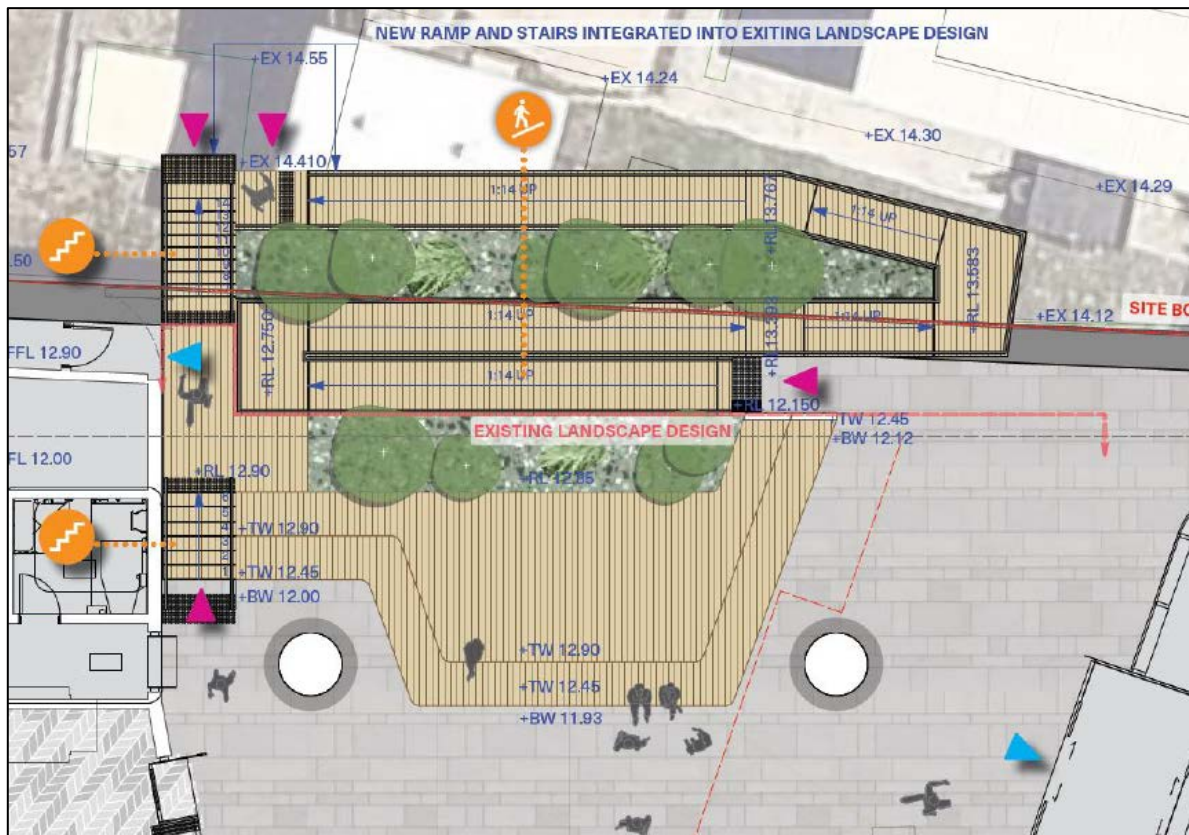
| Future connection to Lancer Barracks (Source: RtS)
